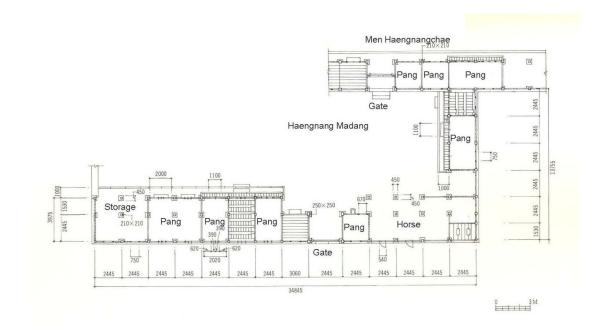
Haengnangchae Floor Plan (N. Zu 2003)
